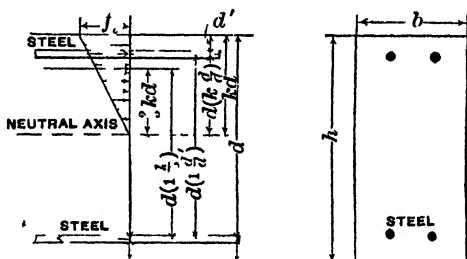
Resisting Forces with Steel in Top and Bottom of Beam.
